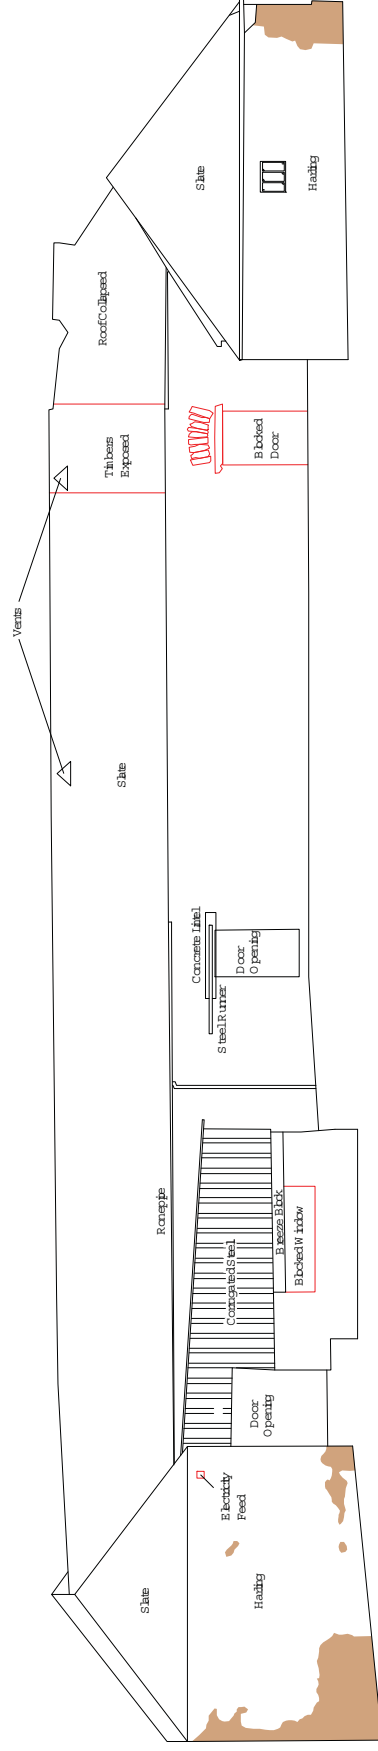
Blocked entrance with splayed stone headwork. Building 2, north elevation.
